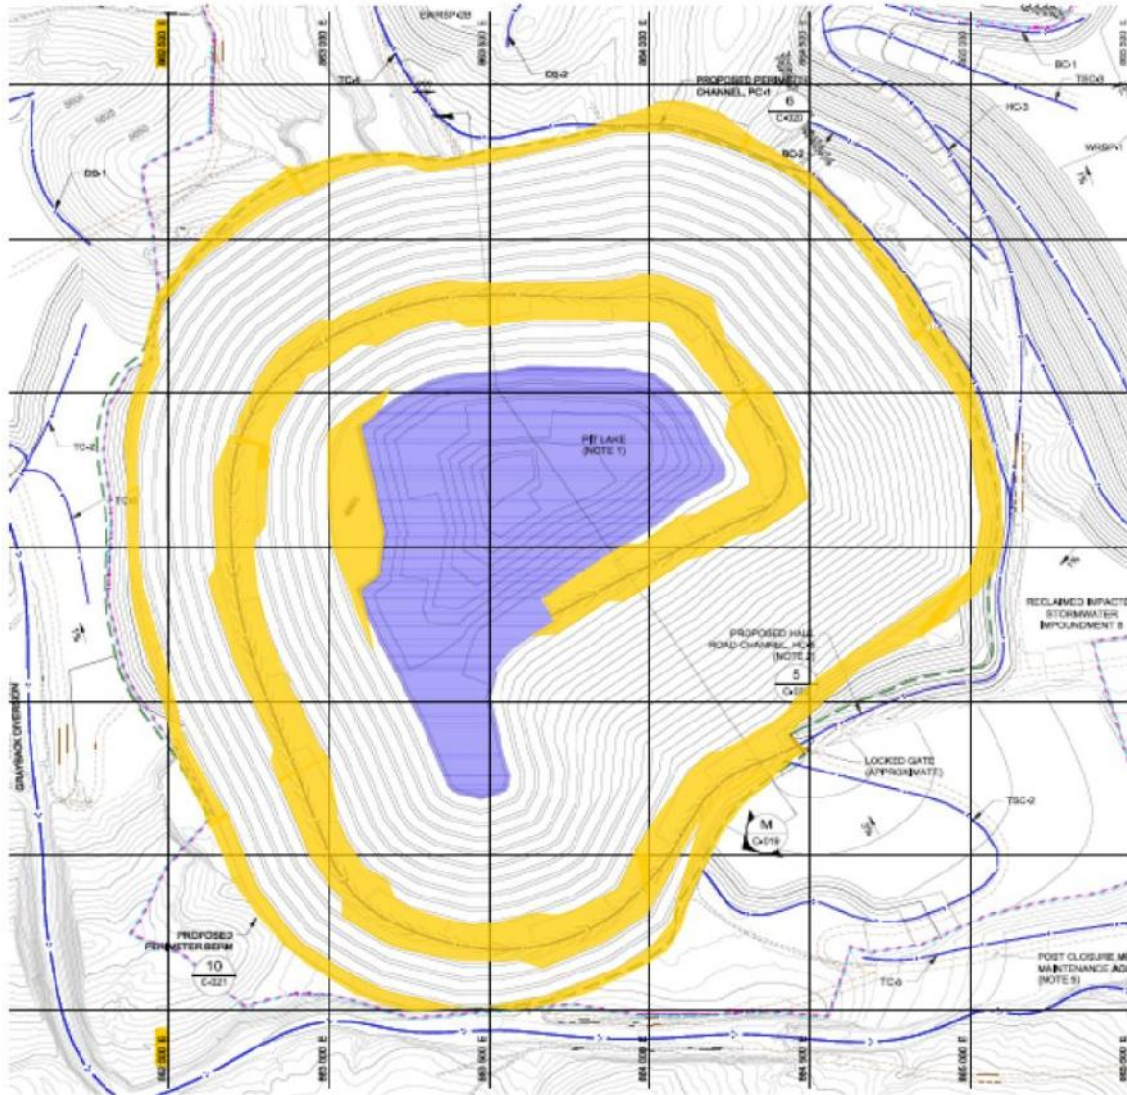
2017 MORP Pit Showing Reclaimed Pit with Pit Lake
